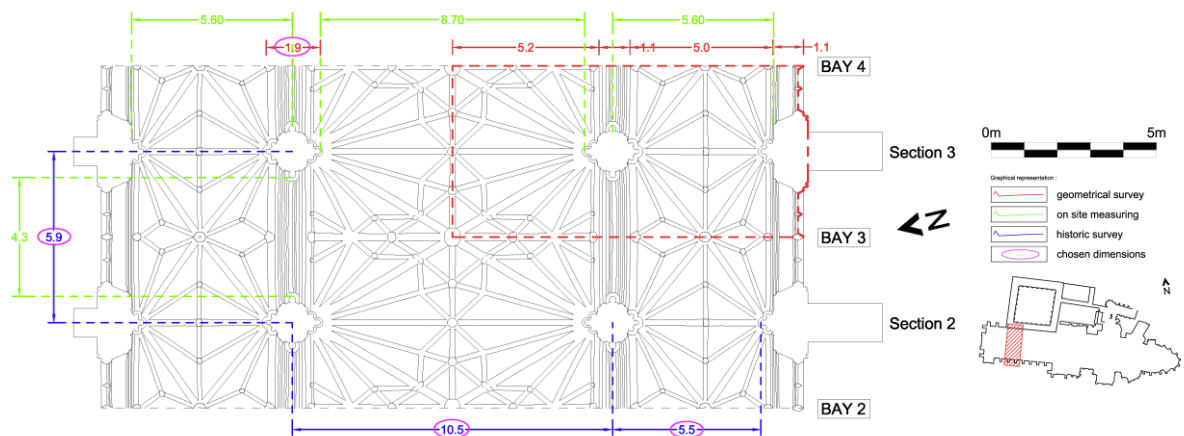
Top plan of the vertical abutments and vault configuration of the critical area of the nave, depicting dimensions (meters) based on the historic survey, the in situ inspection and the geometrical survey provided by Morton Partnership Ltd.
